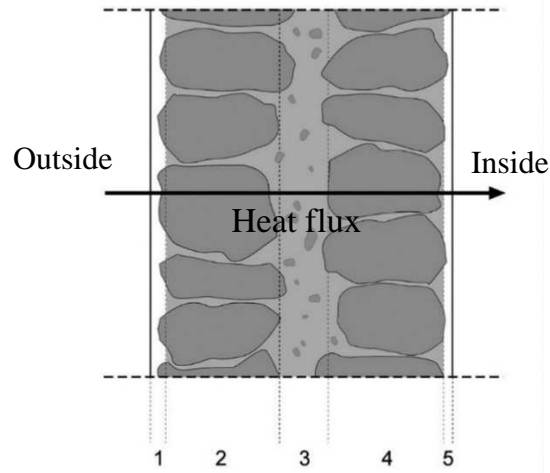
Traditional Mediterranean wall: double leaf masonry wall.
